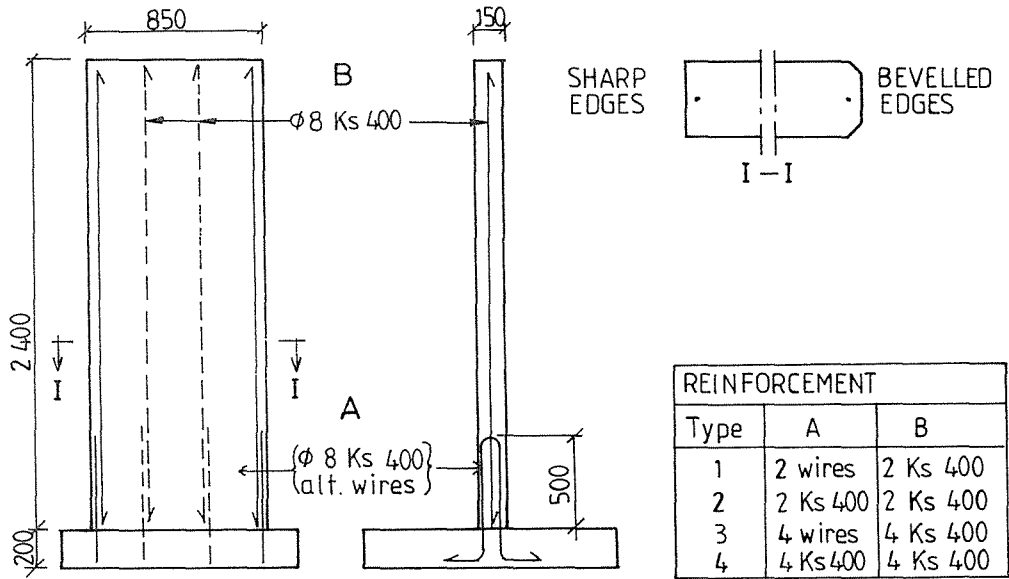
Wall specimens. The form surface consisted of steel, impermeable plastic coated plywood or rough sawn timber.
